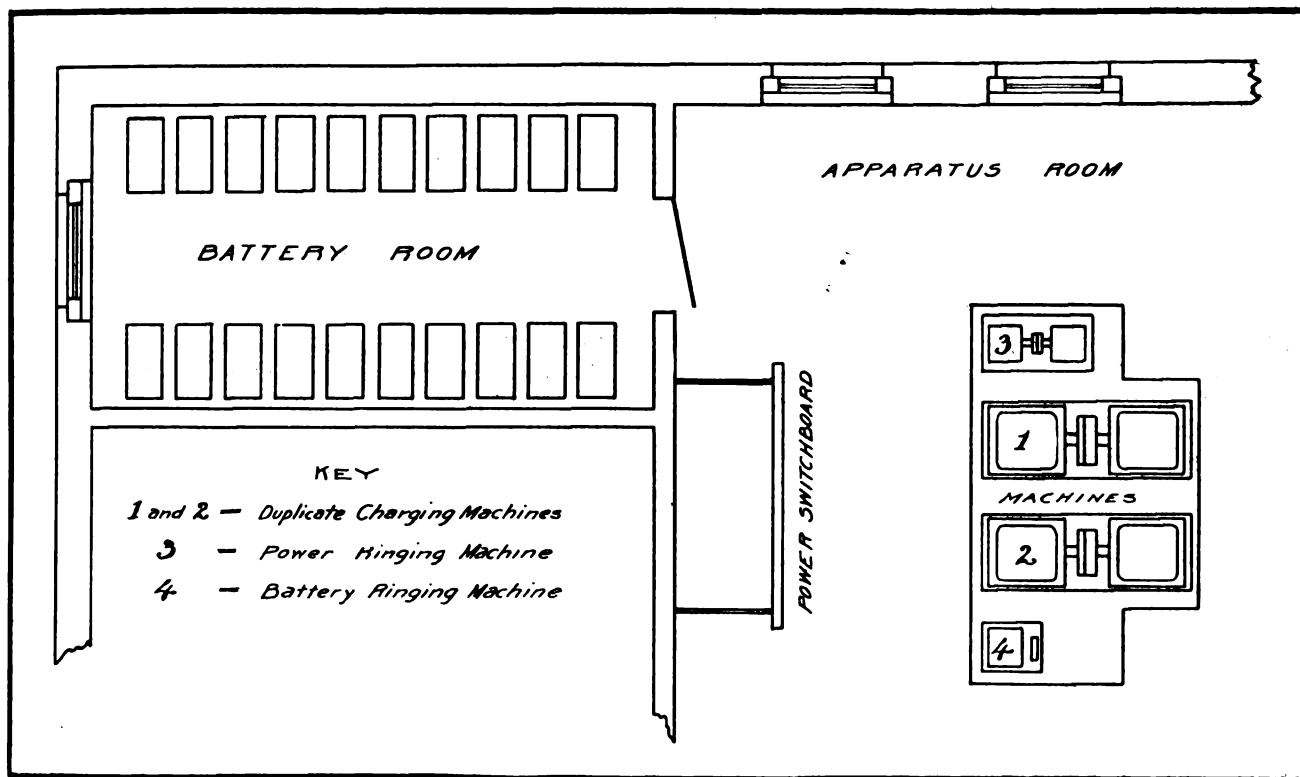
Floor plan of Power Room of a Telephone Exchange.
